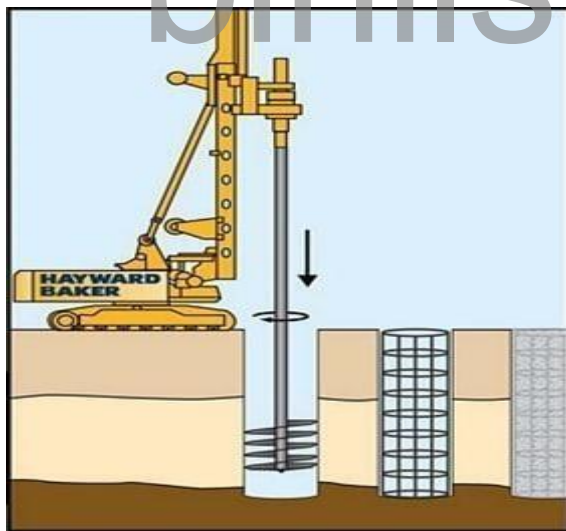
Drilled Shafts or Caisson Foundation (Source: Hayward Baker)
